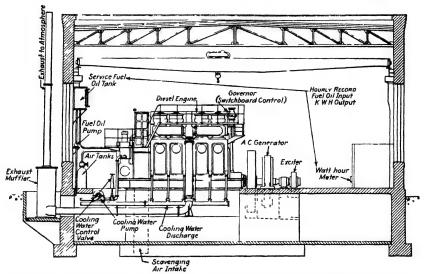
Diesel engine power plant. (Courtesy of Busch-Sulzer Brothers Diesel Engine Company.)
